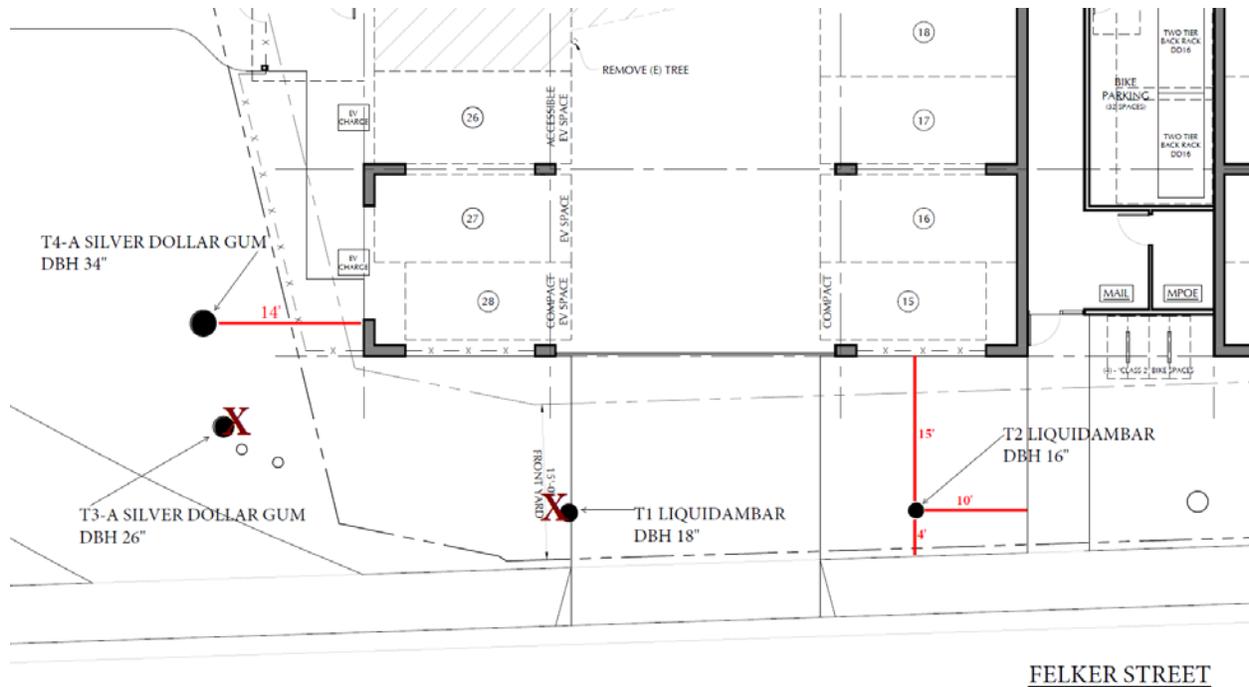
Tree T4-A, silver dollar gum, distance to new building.
